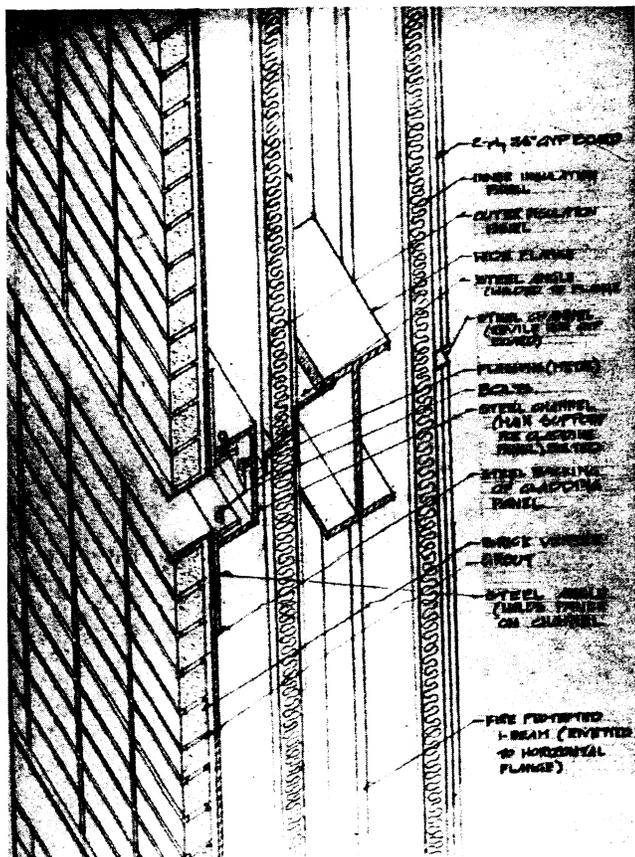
Zachary Burns, drawing from IRCAM Building, Renzo Piano Building Workshop
